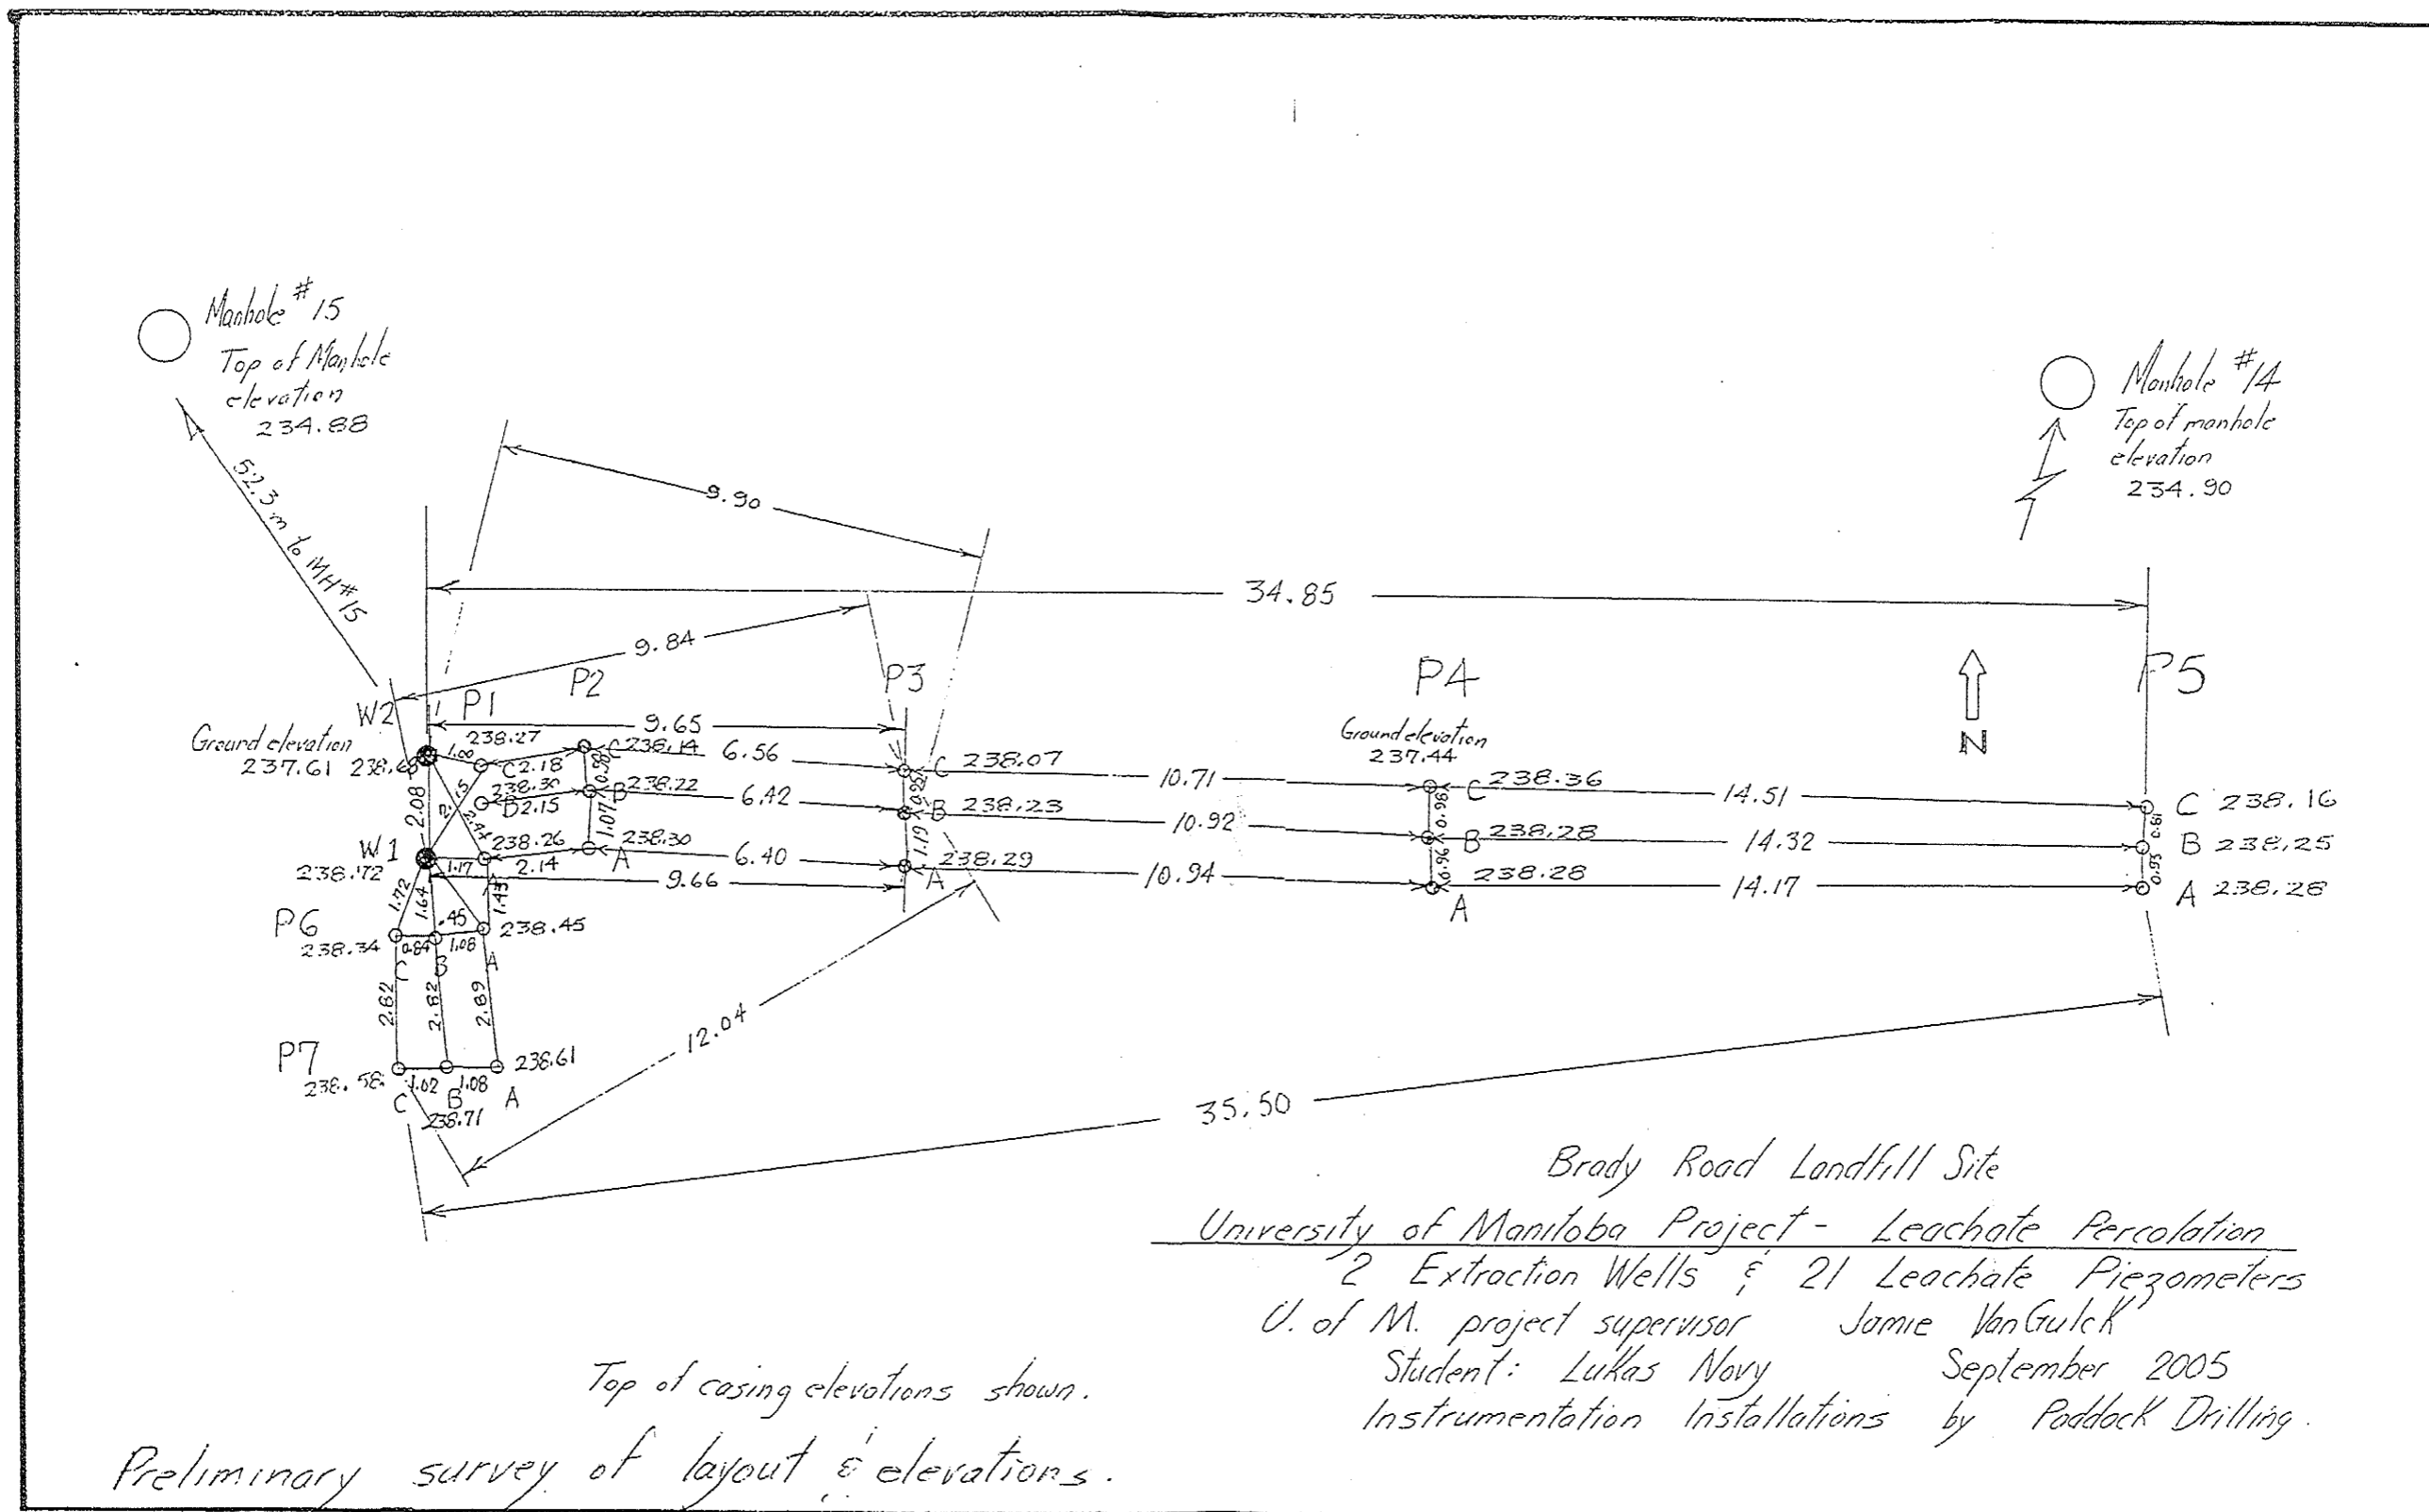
Survey of Site Layout and elevations conducted by the City of Winnipeg, Solid Waste Division
